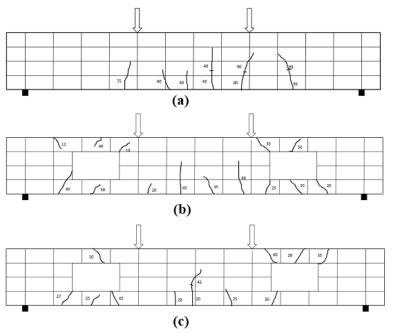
Pattern of cracks of the tested beams: (a) BSF; (b) BSFO; (c) BSFO-IF
